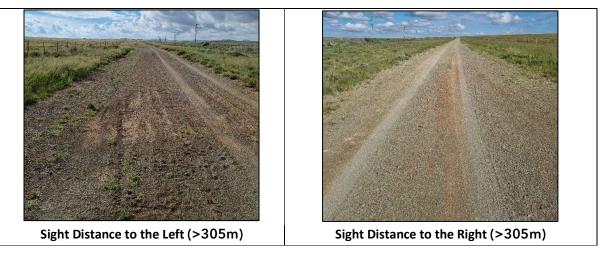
Shoulder Sight Distance (SSD) at Existing Access along Burgerville Road
